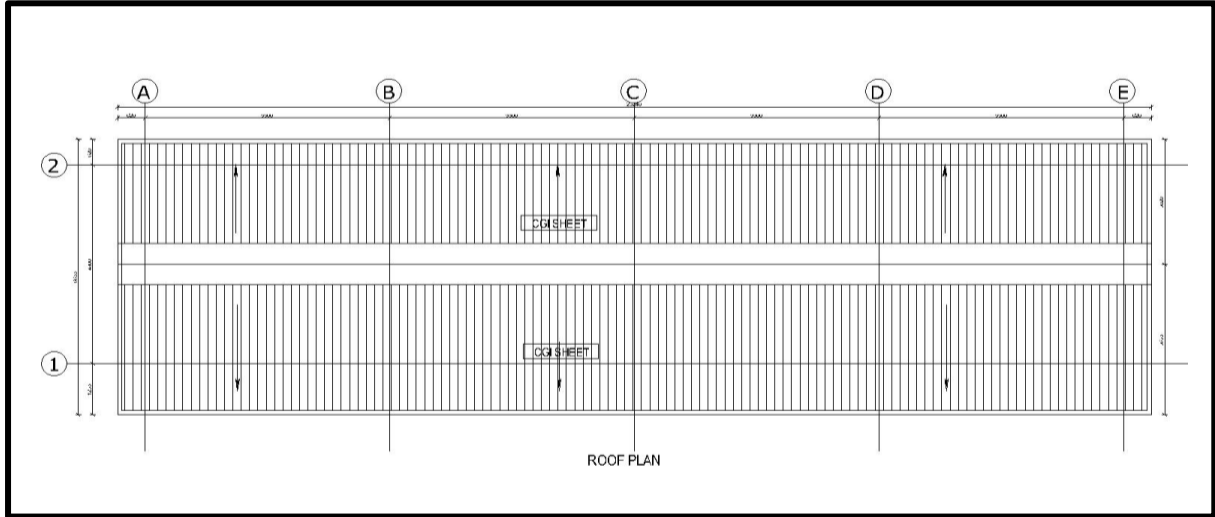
General Layout Plan of the Proposed Building (Roof Floor Plan)
